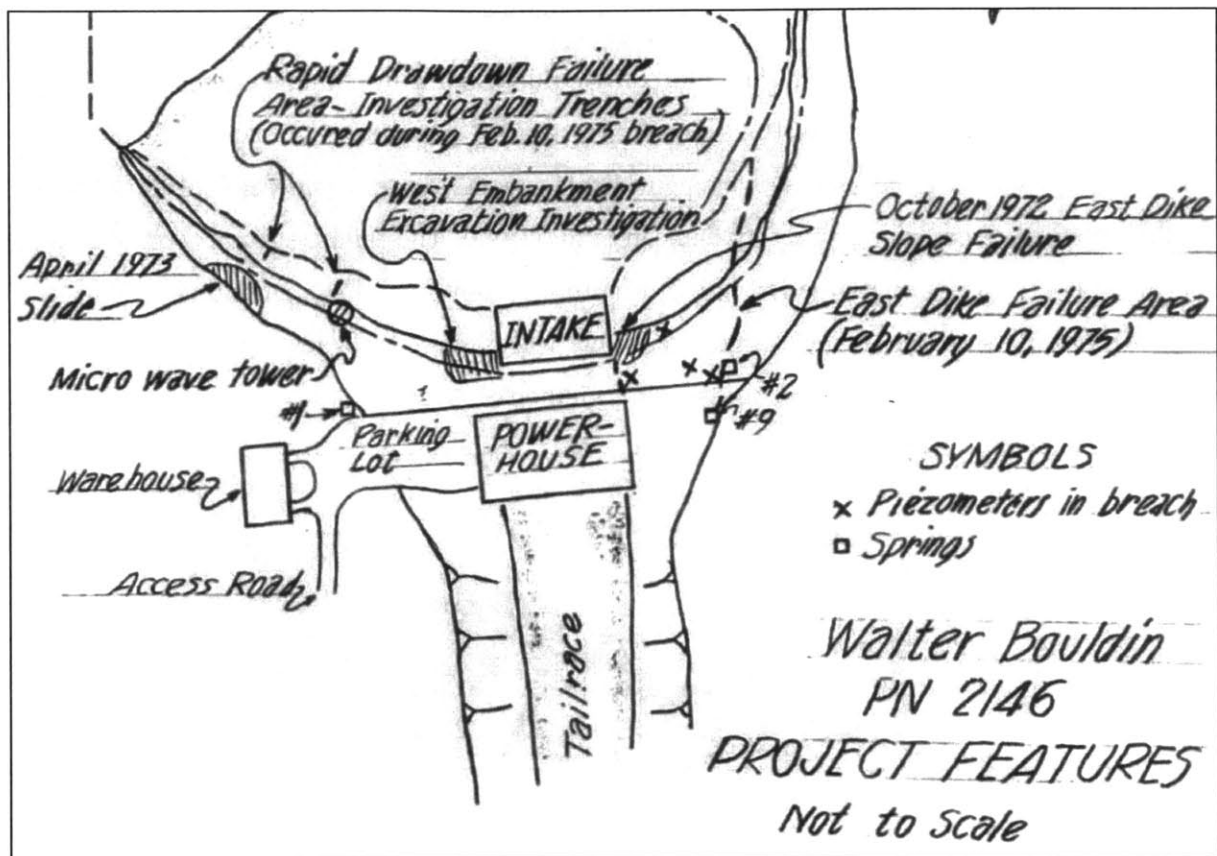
Bouldin Dam plan view sketch of failure areas (FERC, 1978).
